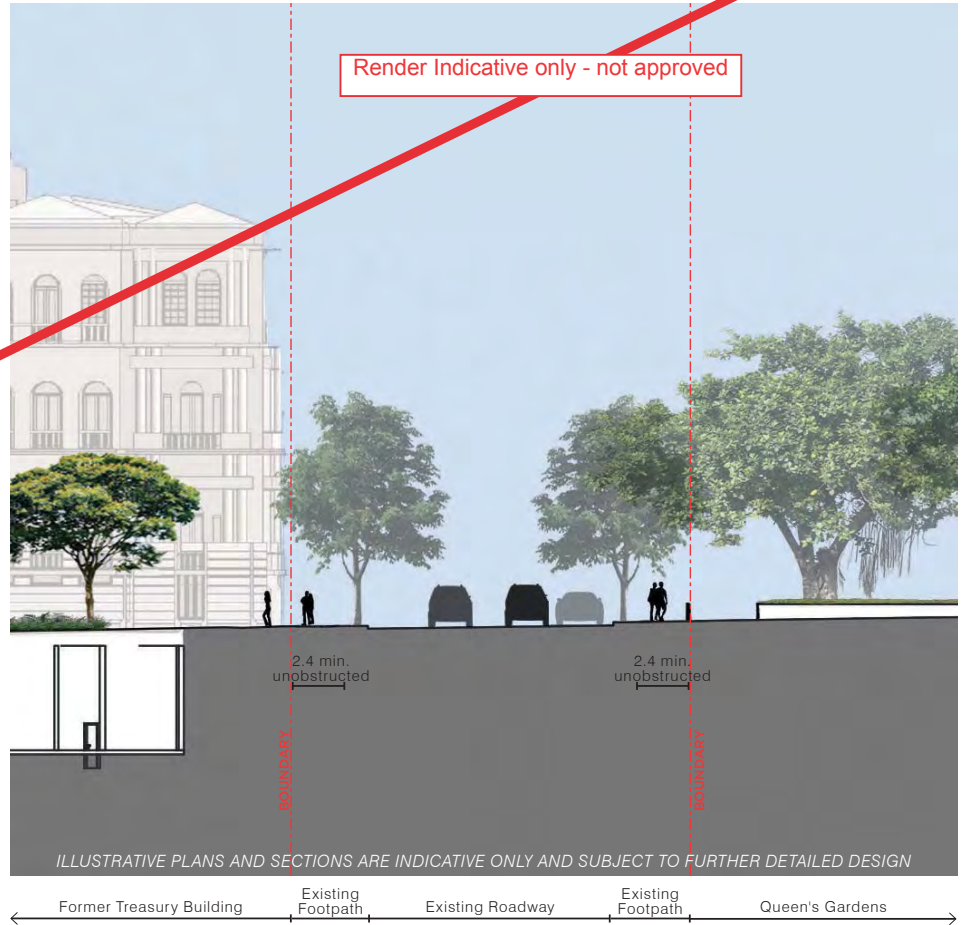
Elizabeth Street sectional elevation at South of Queen's Gardens and former Treasury Building
